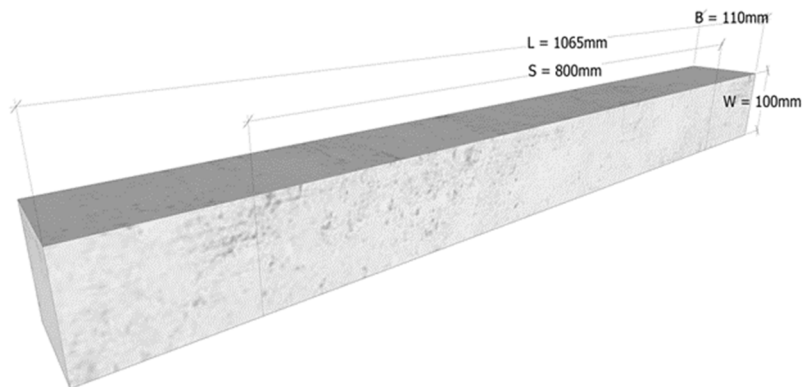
Dimensions for plain concrete beam specimen for fatigue laboratory testing.
